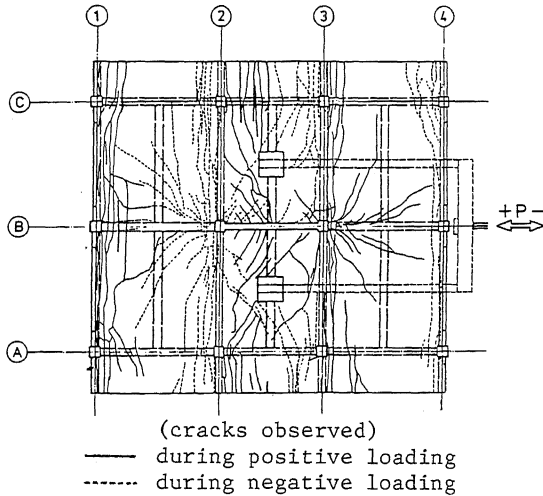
Crack Patterns of Second Floor Slab
